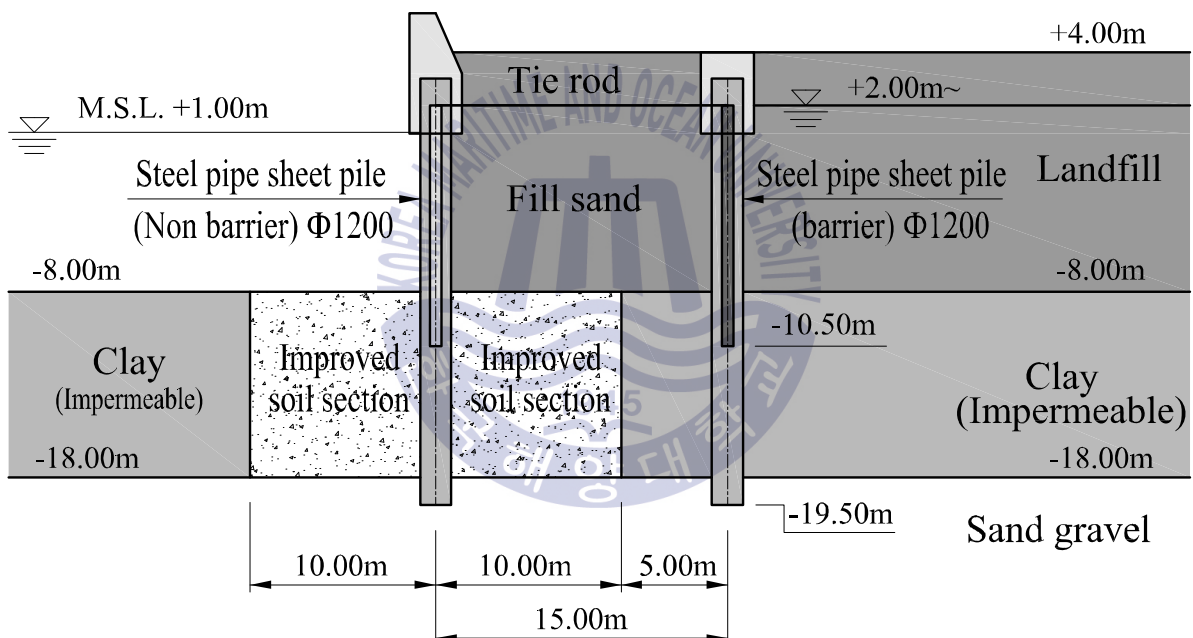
Cross section and soil condition of double STSP type quay wall
